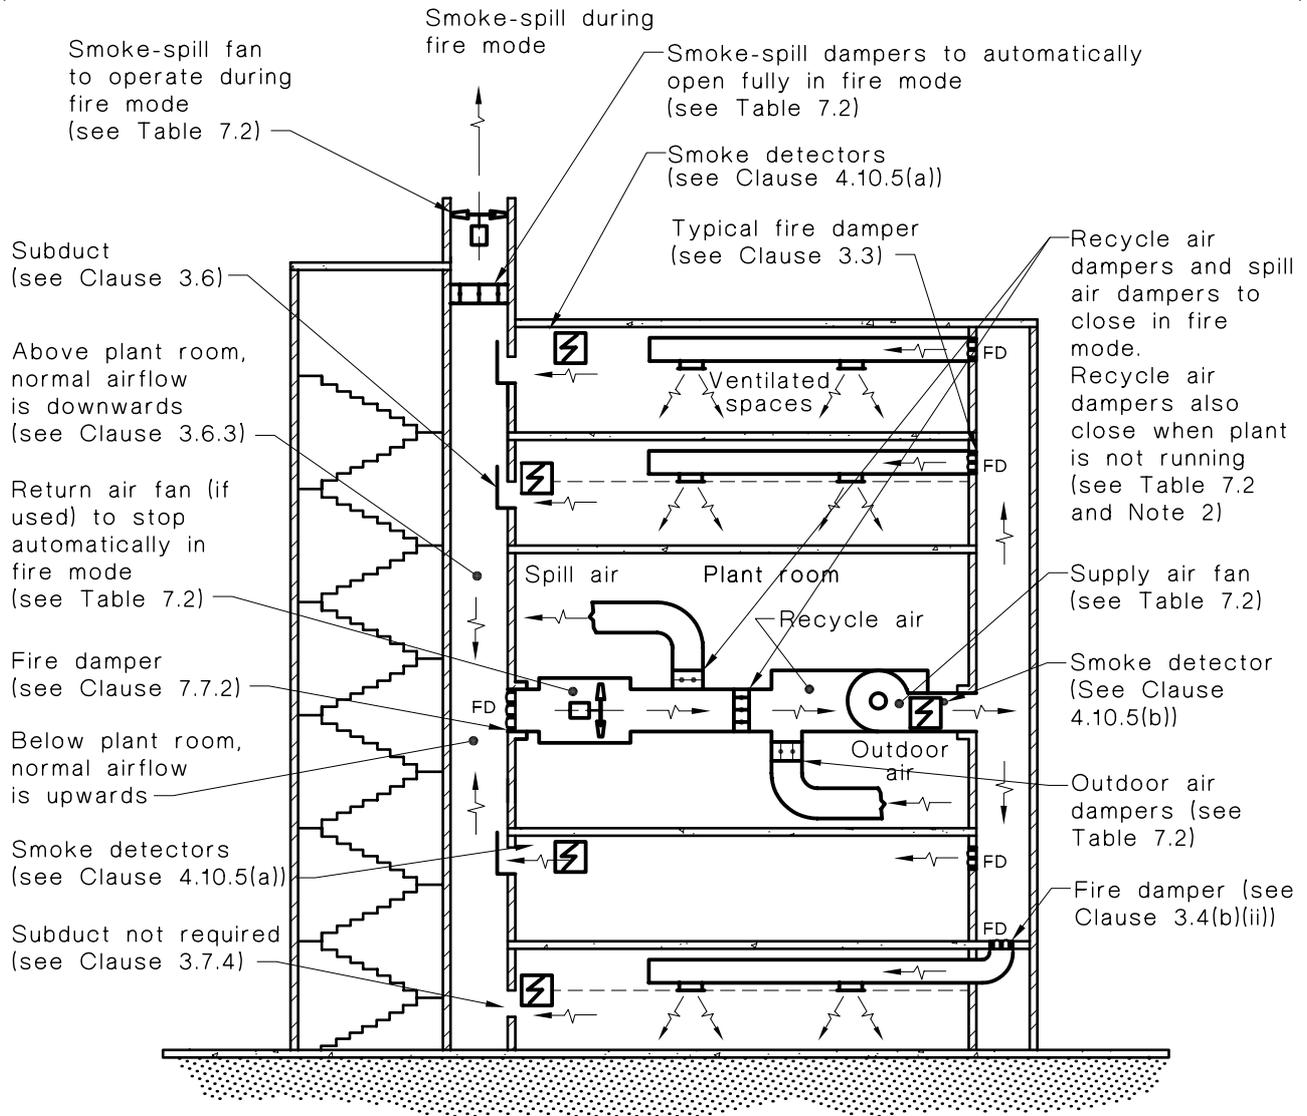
AIR PURGE SYSTEM—TYPICAL INSTALLATION WITH PLANT ROOM BETWEEN SPACES BEING SERVED
